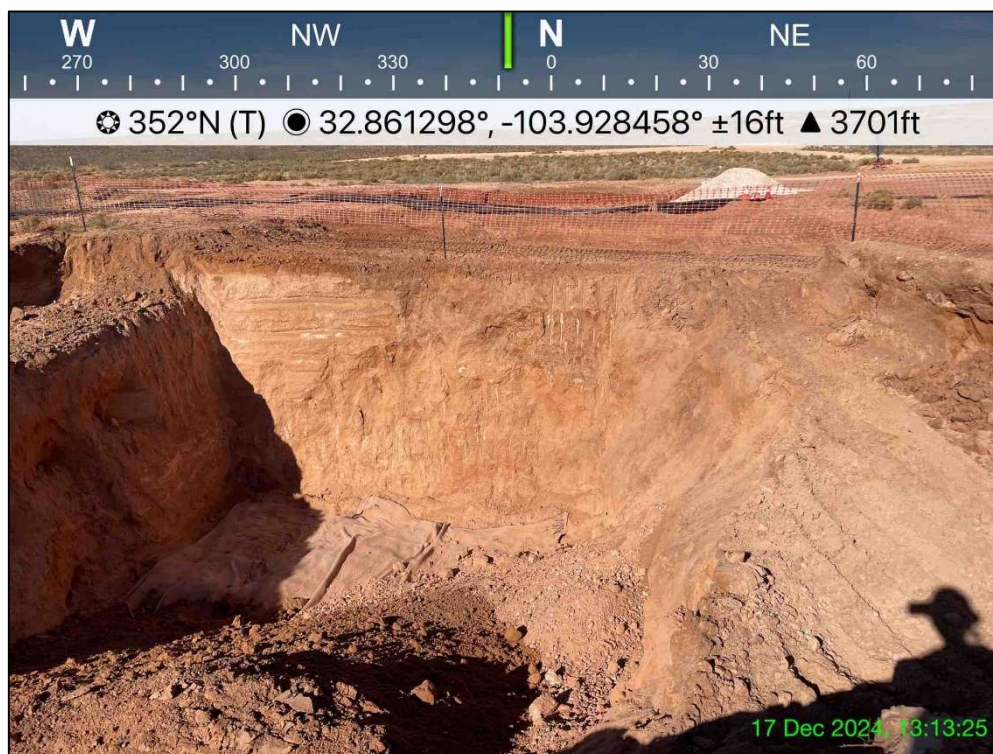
Excavation overview, facing west-north FL06@20 and SW15
